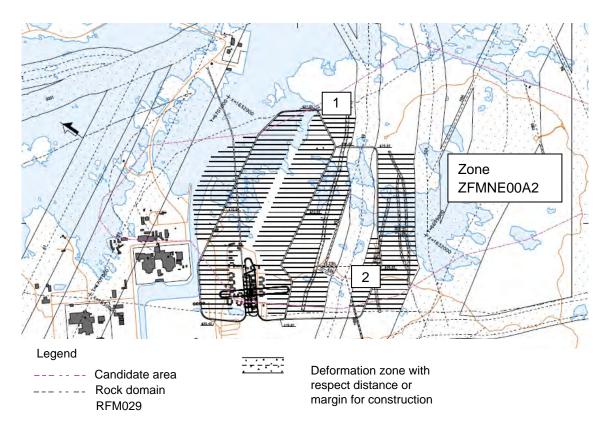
Layout 2, depth 400 m. The markings 1 and 2 show possible areas for the shafts for exhaust air.
